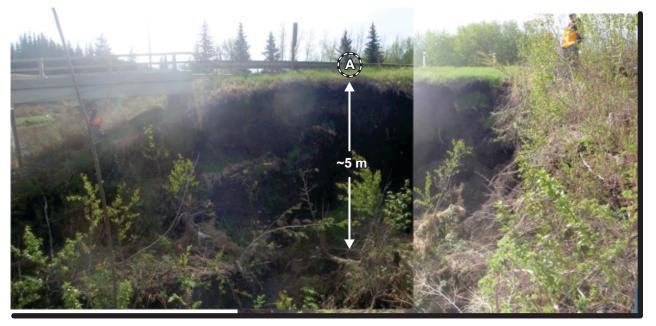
• A scarp steepening along side slope at bridge approach • Limited (0.3 m to 0.5 m) setback space at top (A)
